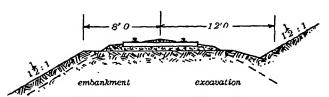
B Roadbed Stone or Gravel hallast Straight line
